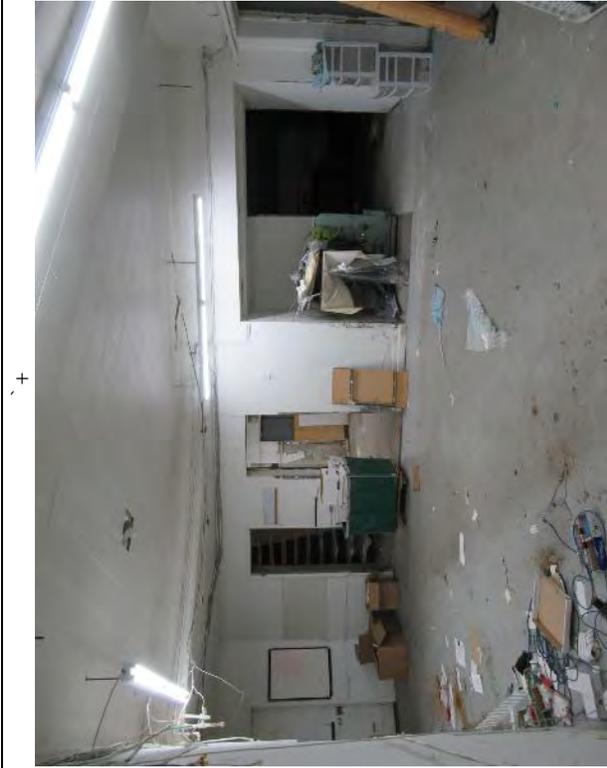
Edina Cleaners main level space and stairs to partial upper level
